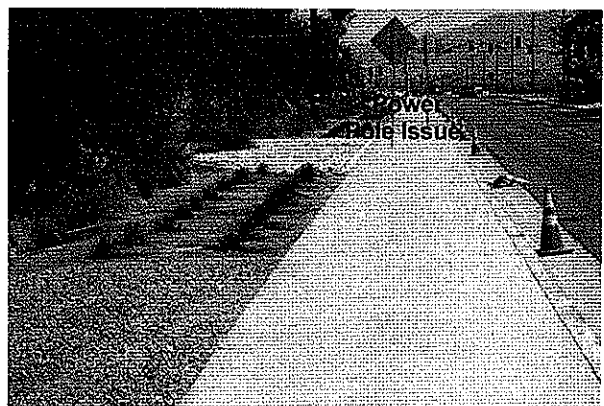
Phase 1 construction will connect to stub near existing utility pole. Design will consider ways to reduce impact to new road improvements.
